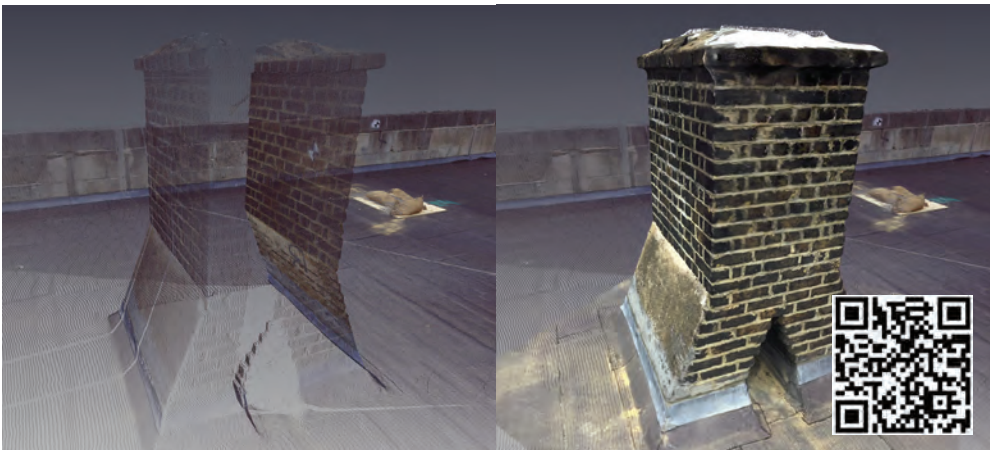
Scanned and photogrammetric view of a pillar on the roof of the former Southeastern railway offices at London Bridge Station
